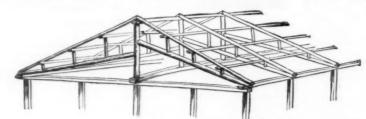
ROOF FRAME OF LARGE BUILDING.
